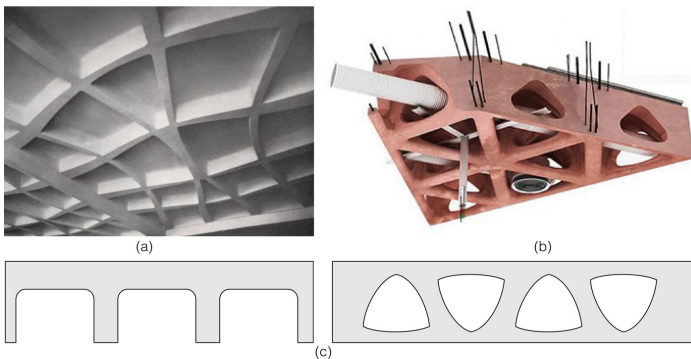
Slab geometries with cavities for weight-saving: (a) Floor slabs in Palazzo dello Sport (Halpern et al., 2013); (b) Holedeck waffle slab system (Holedeck, 2019).
